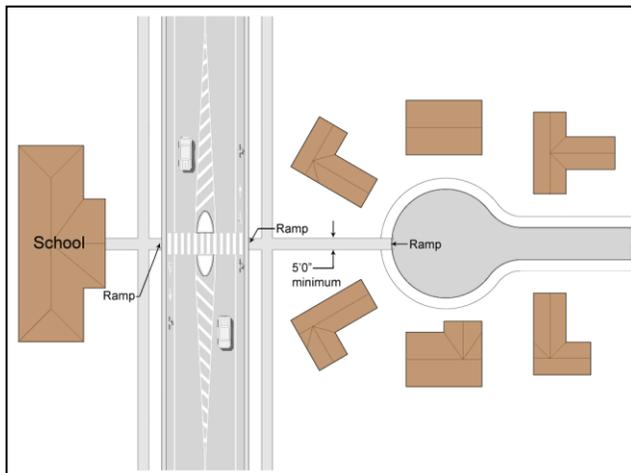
Off-street pedestrian connector facilities provide direct access to destinations and sidewalk systems that could only be reached by street-based routes.
